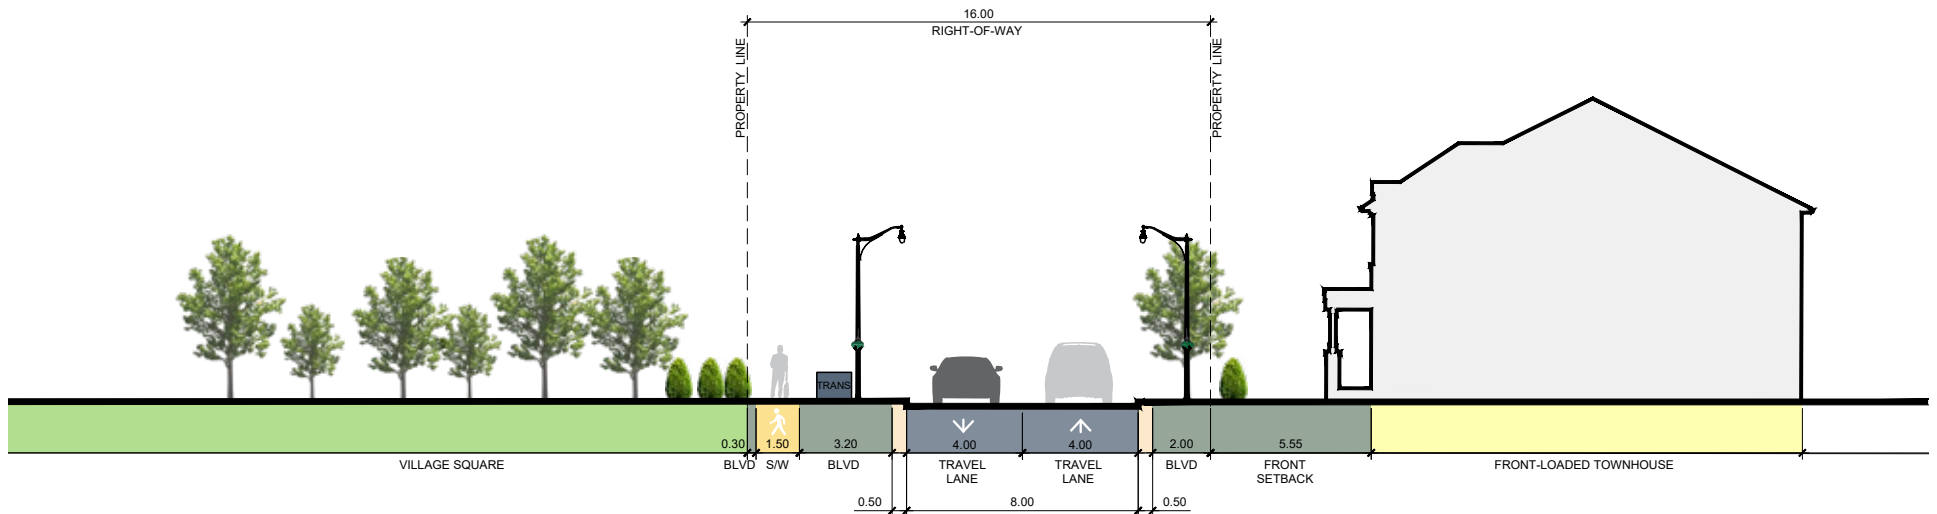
16.0m Local ROW Cross Section (sidewalk on one side)
